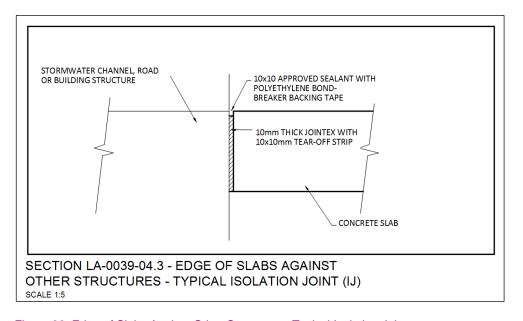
Edge of Slabs Against Other Structures - Typical Isolation Joint
